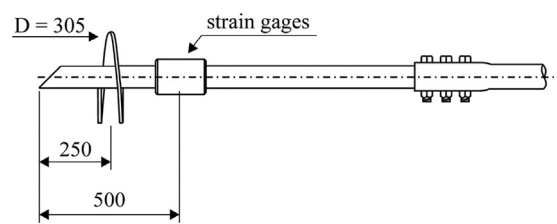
Instrumented lead section of the helical anchors tested (dimensions in mm).
